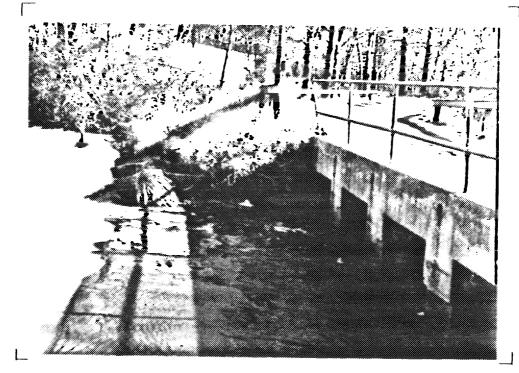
Upstream face of dam, spillway crest and left dam embankment.
